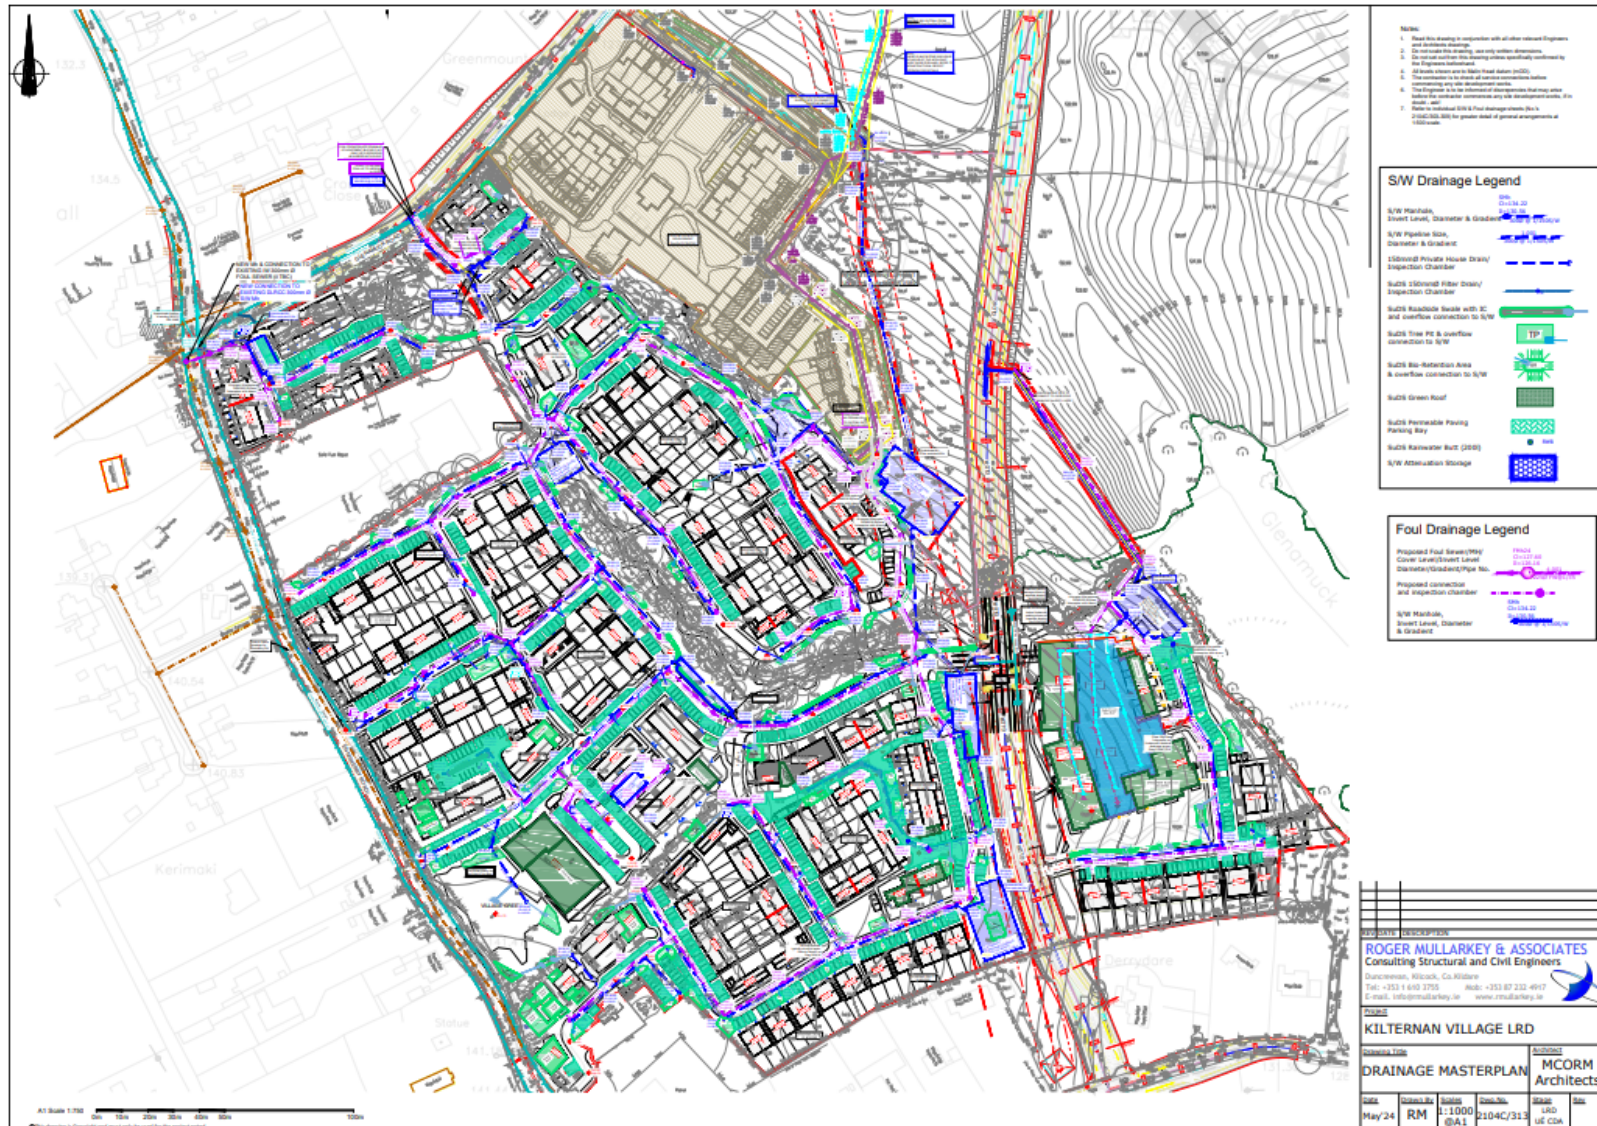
Drainage Masterplan (Roger Mullarkey & Associates, 2024. 2104C/313 Drainage Masterplan)
